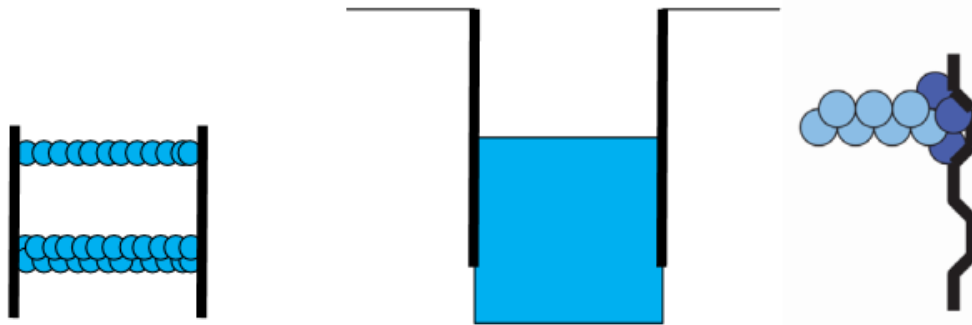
Illustration of Dry DSM panel stabilization inside excavation. Source: (Karlsrud, Eggen, Nerland, & Haugen, 2013).
